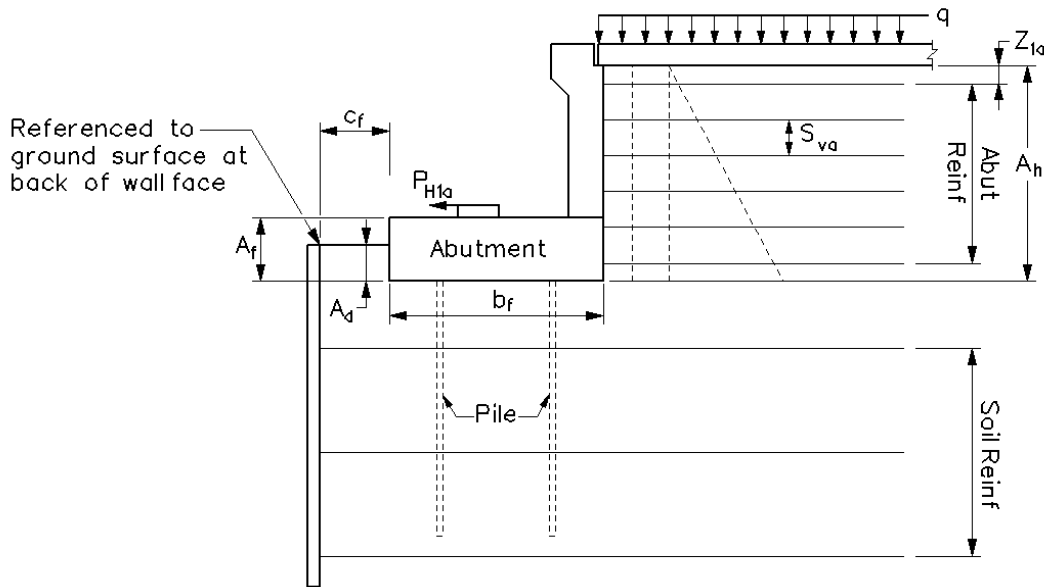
Loads behind the abutment supported on piles (See Figure 4) for internal stability calculations
